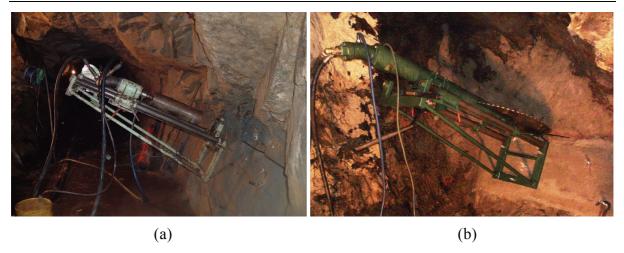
Cutting machine: (a) opening the central hole; (b) cutting the slot
